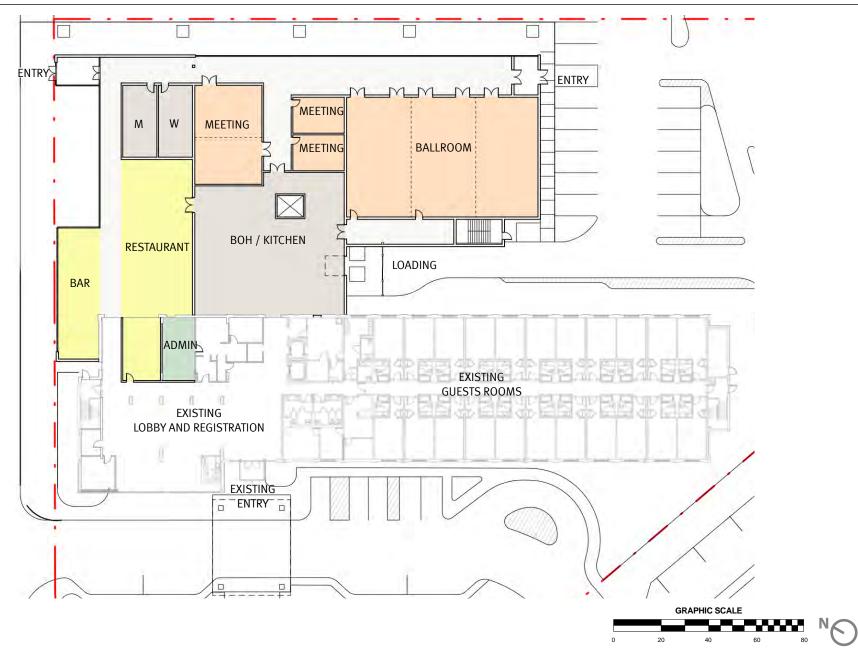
Ground Floor Plan Source: Arrowstreet, 2014
